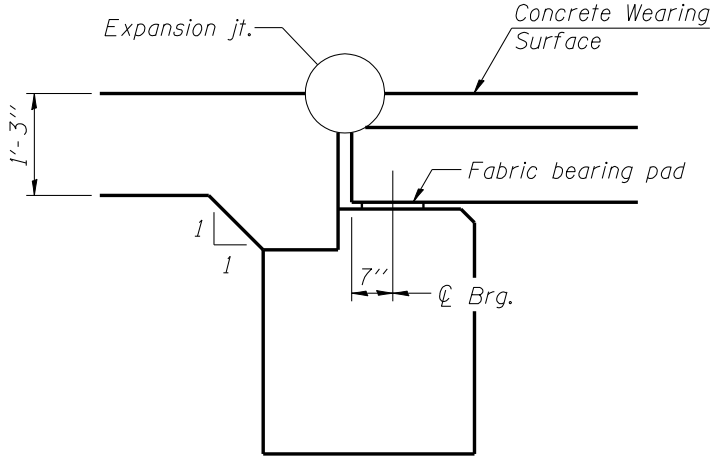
through 3.5.7.1-3 show the typical cross sections for the various deck beam depths having either a Concrete Wearing Surface (CWS) or a Hot Mix Asphalt (HMA) wearing surface. The abutment is notched on the shallow 11 inch deck beams and a backwall is required on the deeper sections. Figure 3.5.7.1-4 shows the typical cross sections with no approach pavements which may be used on Local projects.
